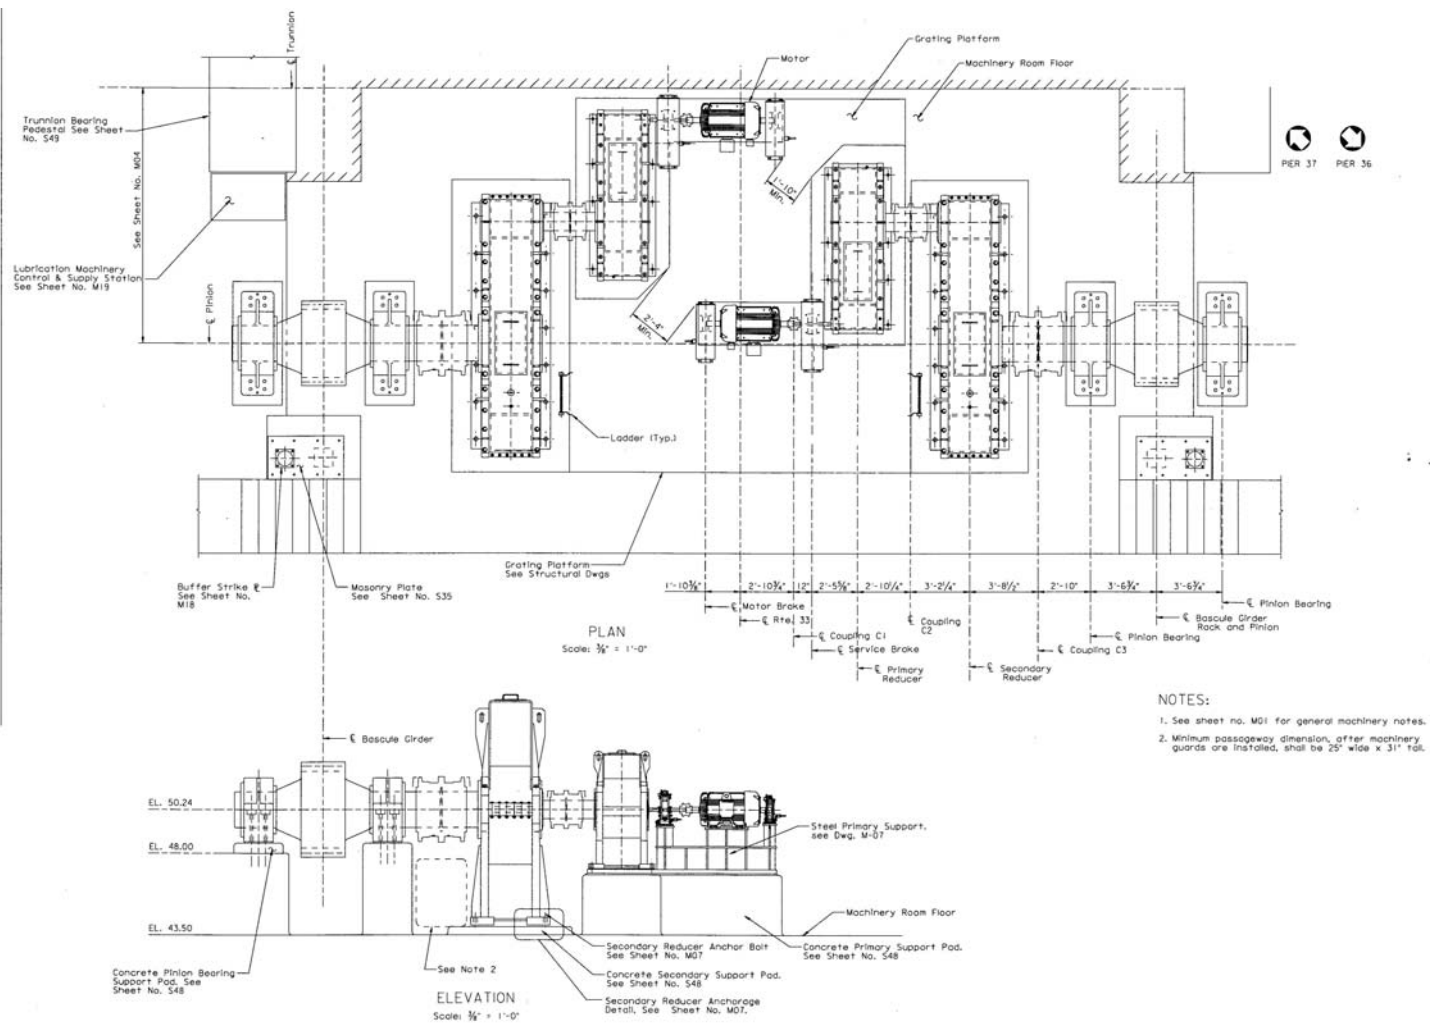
Final Machinery Plan & Elevation for Pamunkey Bridge
